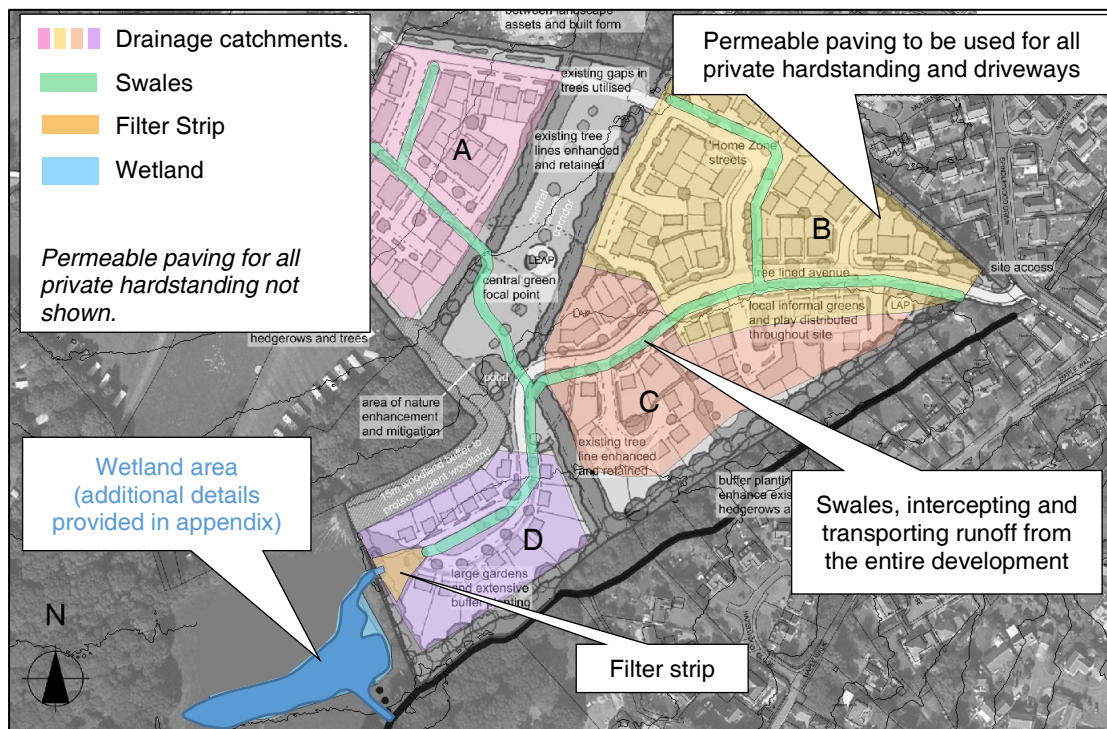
Indicative drainage layout plan showing the proposed SuDS and revised wetland extent, following natural the natural topography.
